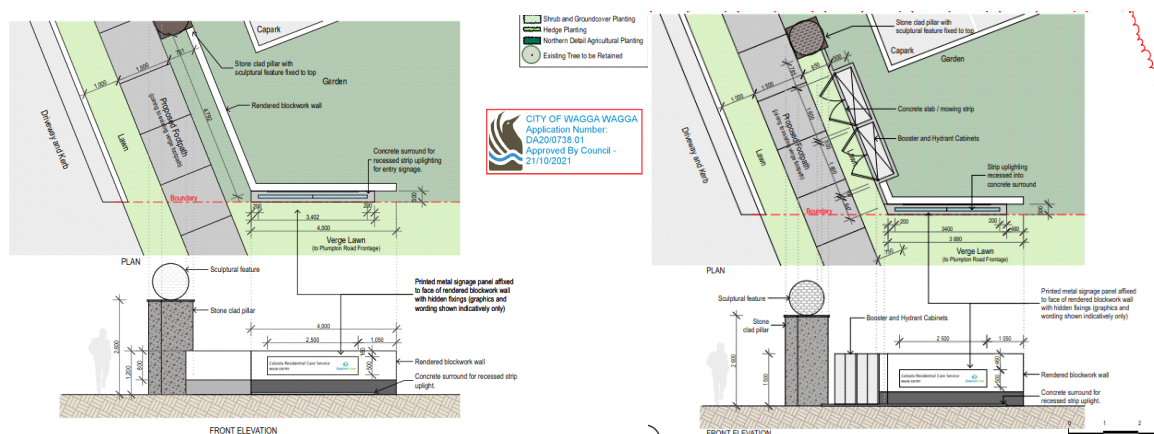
Approved Plan (Left) and Proposed Plan (Right)
